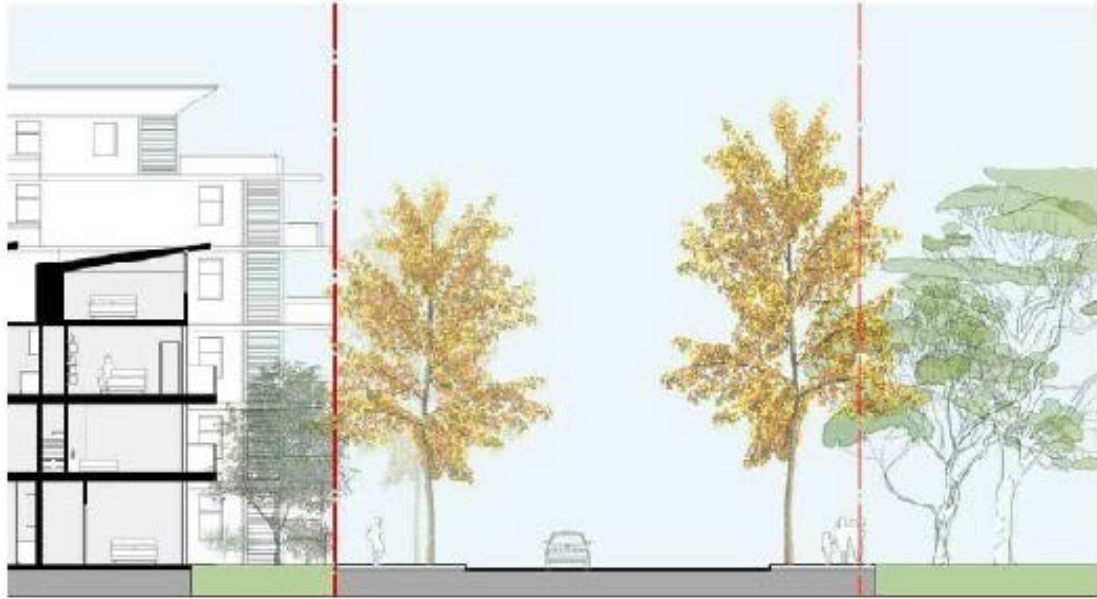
Section 5 Campbell – Park edge street (Getting extension)
